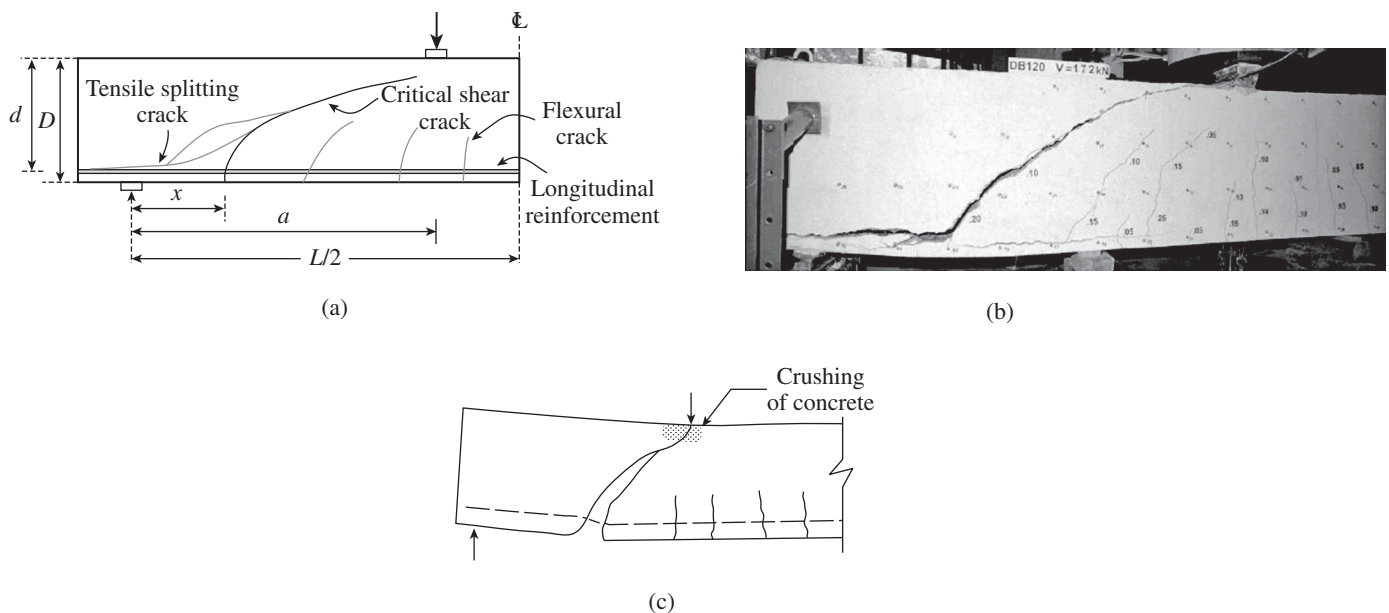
Behaviour of beam without shear reinforcement (a) Typical crack pattern (b) Typical failure of beam without shear reinforcement (c) Shear-compression failure
